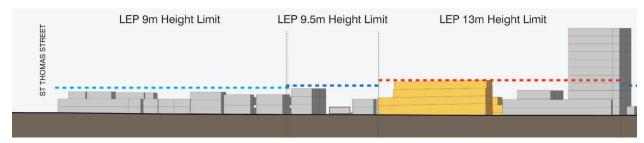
Recommended Macpherson Street Elevation for Bronte RSL Site
